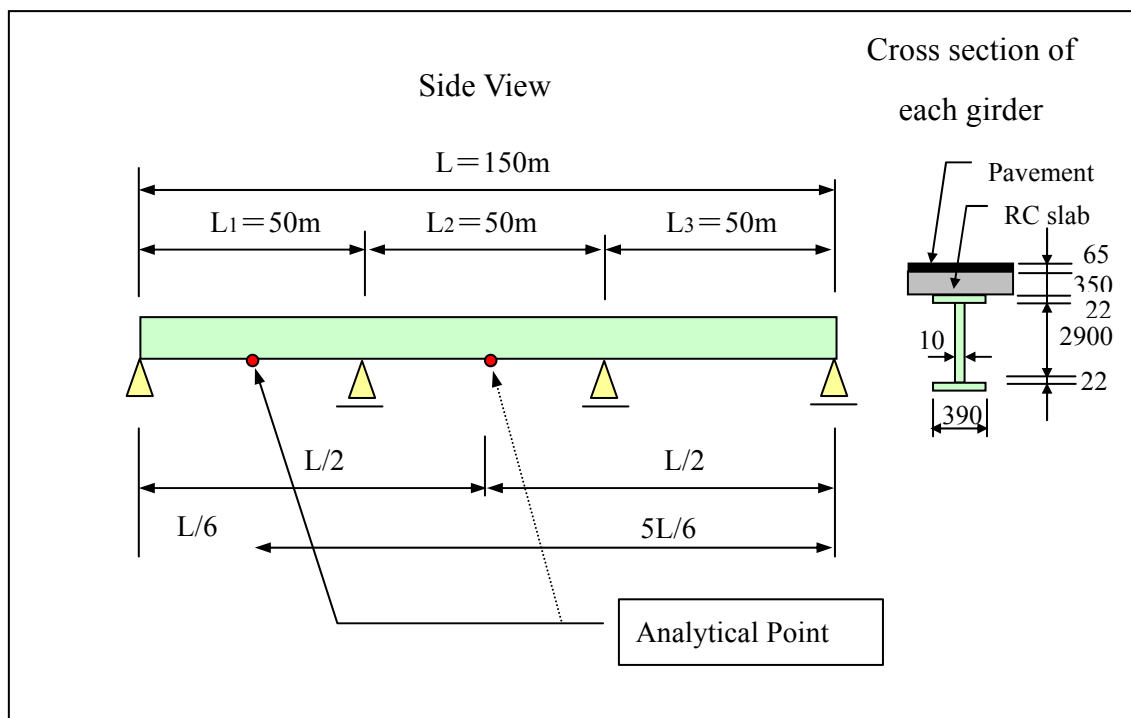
Structural model for three-span continuous steel bridge with I-shape girders
